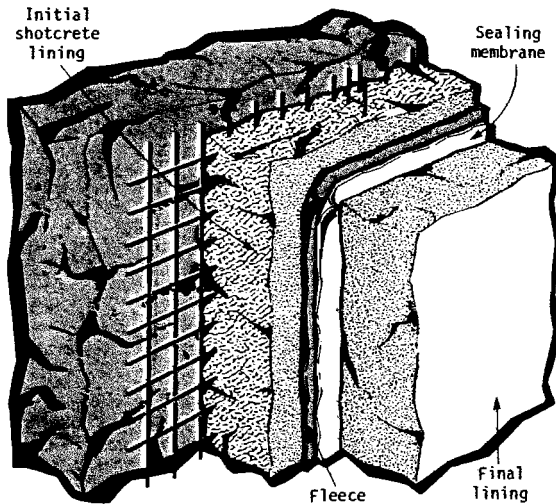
Tunnel Membrane Detail (Martin, 1987)
